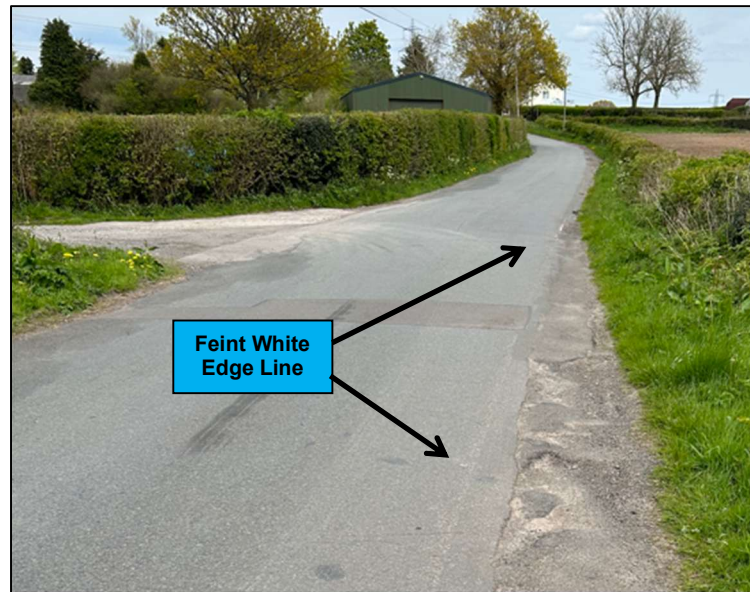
PENYLAN ROAD TO THE EAST OF THE SITE (LOOKING EAST)
